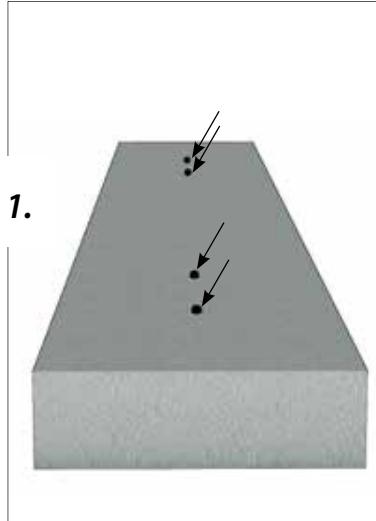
1 (drilled holes on the concrete foundation)
